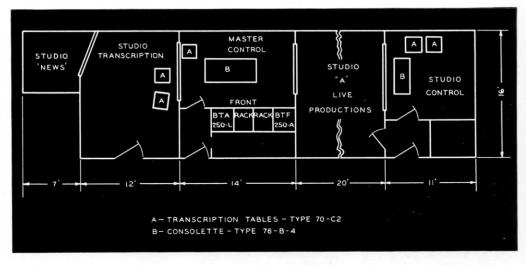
(above). The WSRS single-floor station plan showing transmitter room and studio layout.
